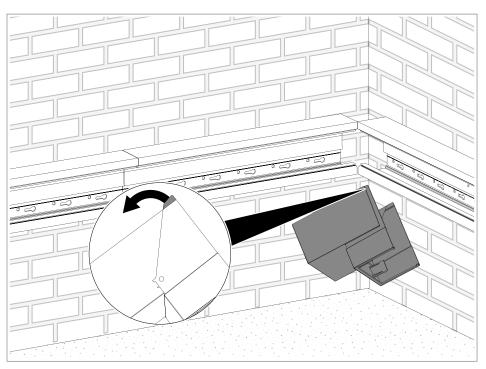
Mounting an internal corner – removing the predetermined breaking point
